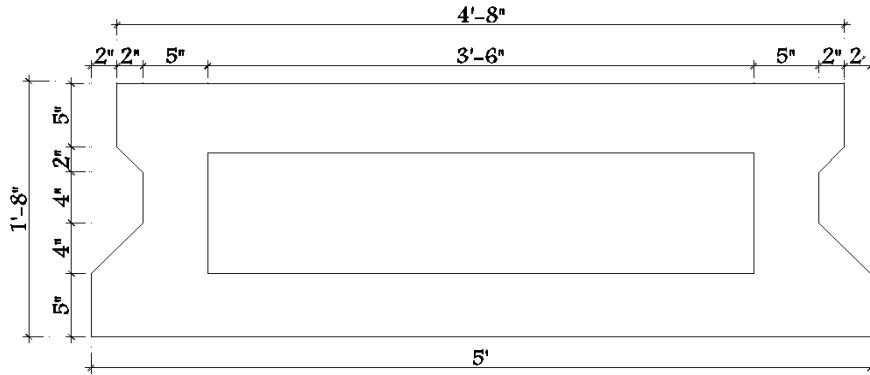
Standard Type 5B20 box beam of Bridge 8825.
